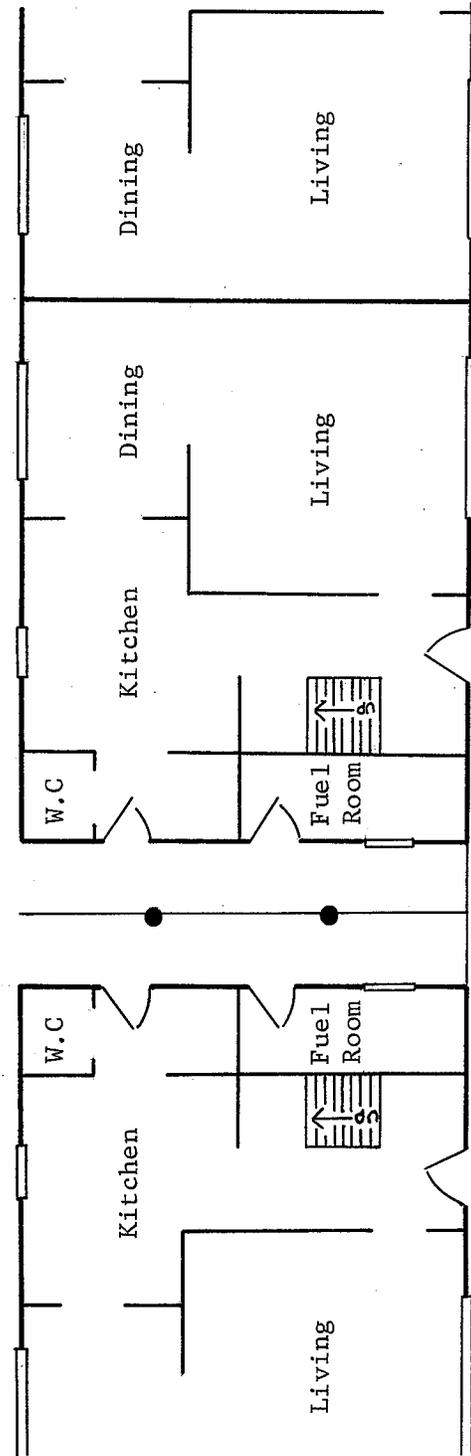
Ground Floor Plan of Adjacent Houses in Coventry, England.
